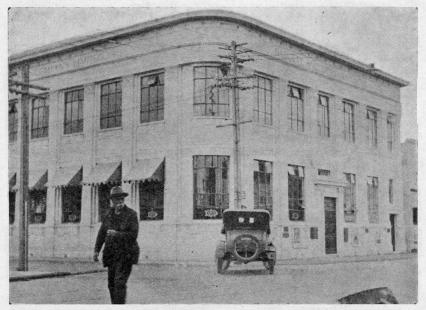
Dalgety's Building, Napier. An example of a well-constructed building which withstood the effects of the earthquake without damage. This view was taken some days after the shock.
